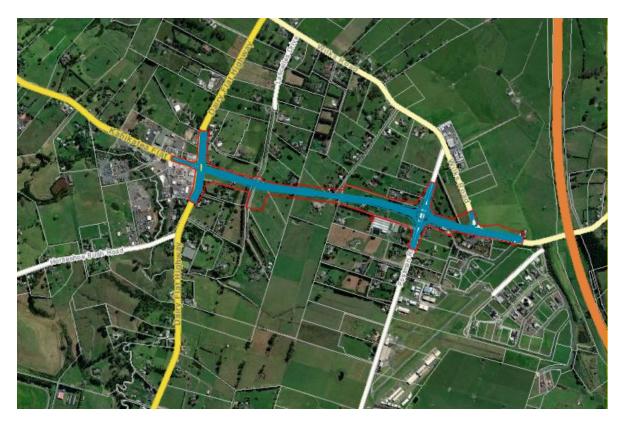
Preferred route for New Connection from Dairy Flat Highway to Wilks Road
